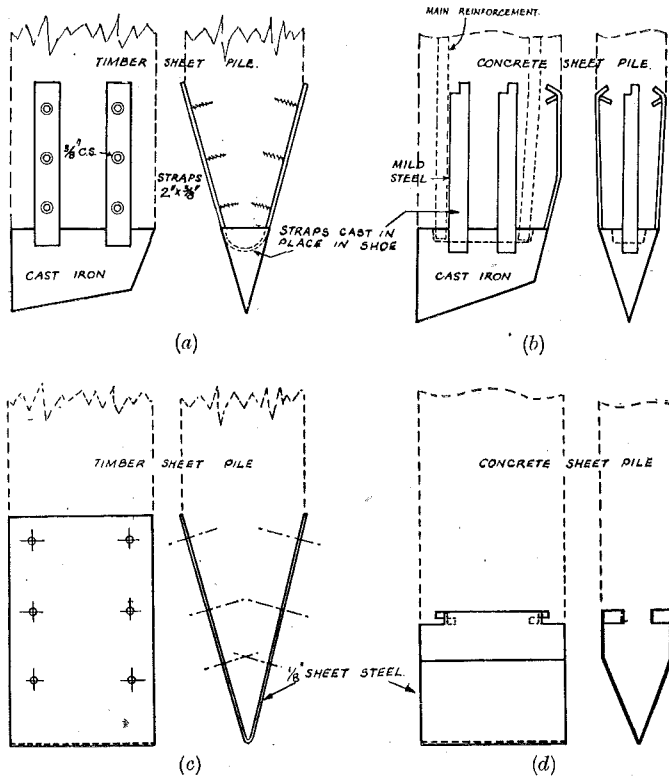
TYPES OF SHOES FOR SHEET PILES.
